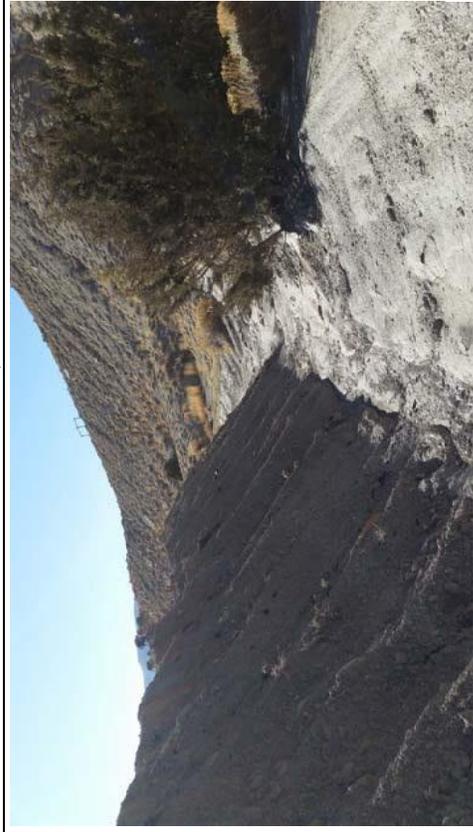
DIVERSION DITCH, WASTE ROCK SITE
